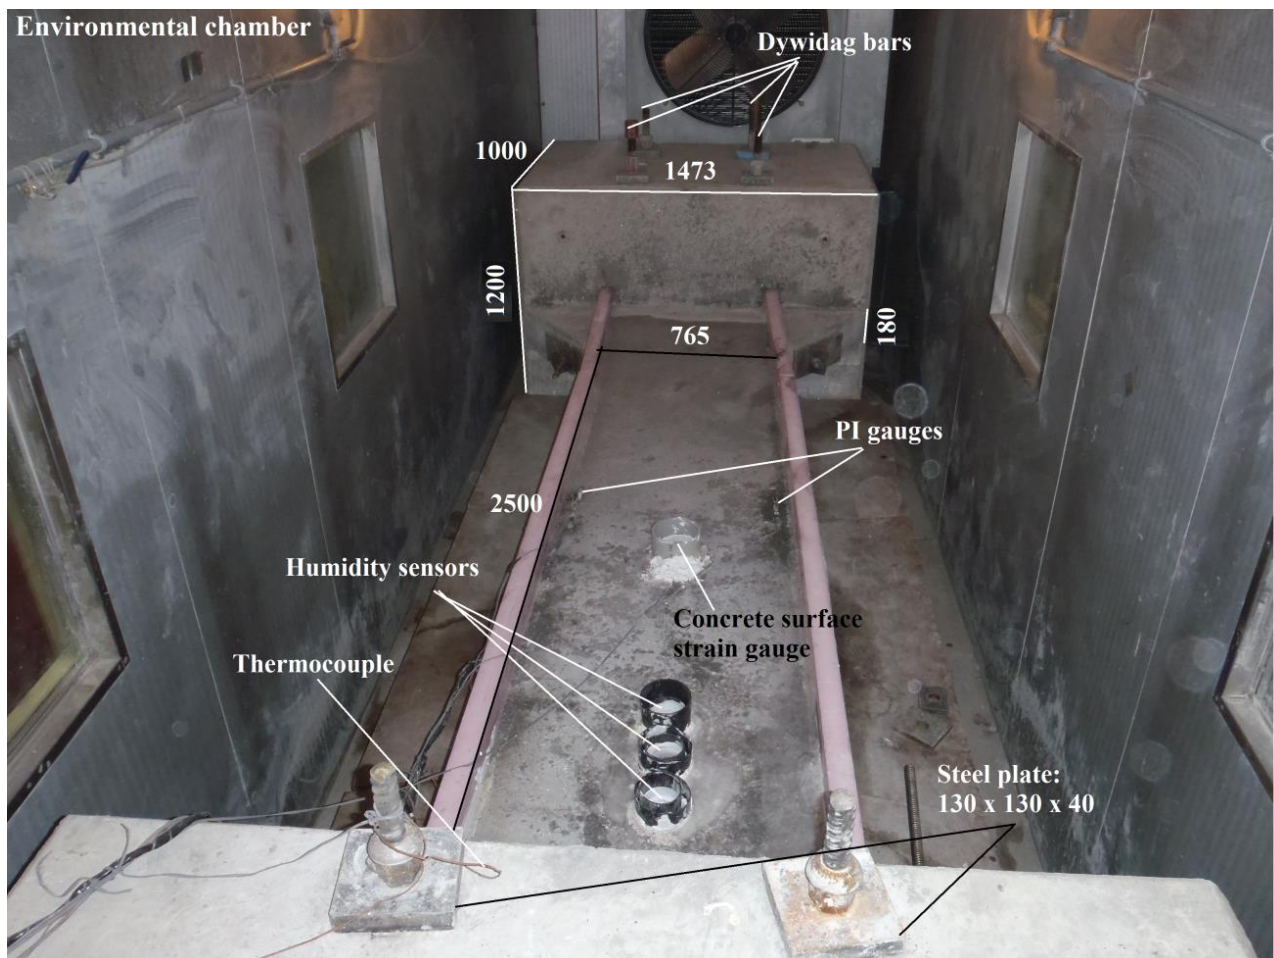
General view of the test setup and specimen into the environmental chamber (all dimensions are in mm).
